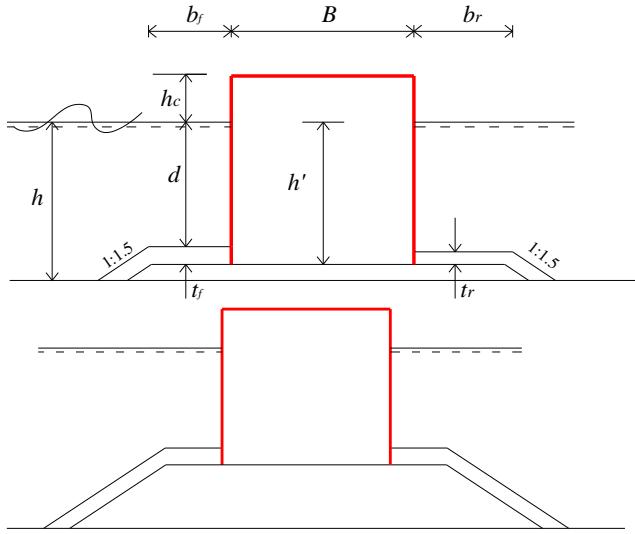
Cross sections of outer caisson breakwaters on bedding layer (top) and on high mound foundation (bottom).
